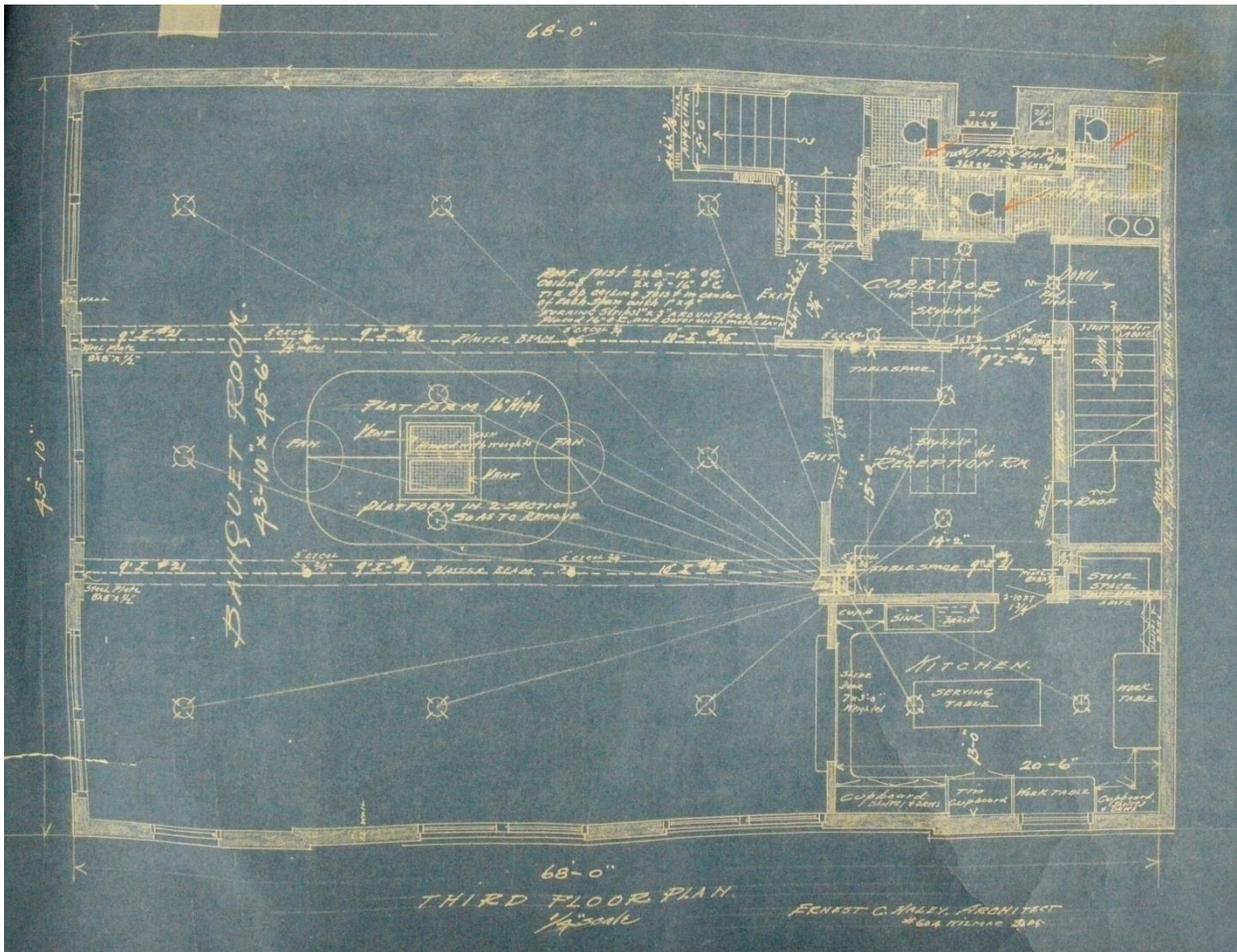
Third floor plan 1920 addition, source: Northwest Architectural Archives
